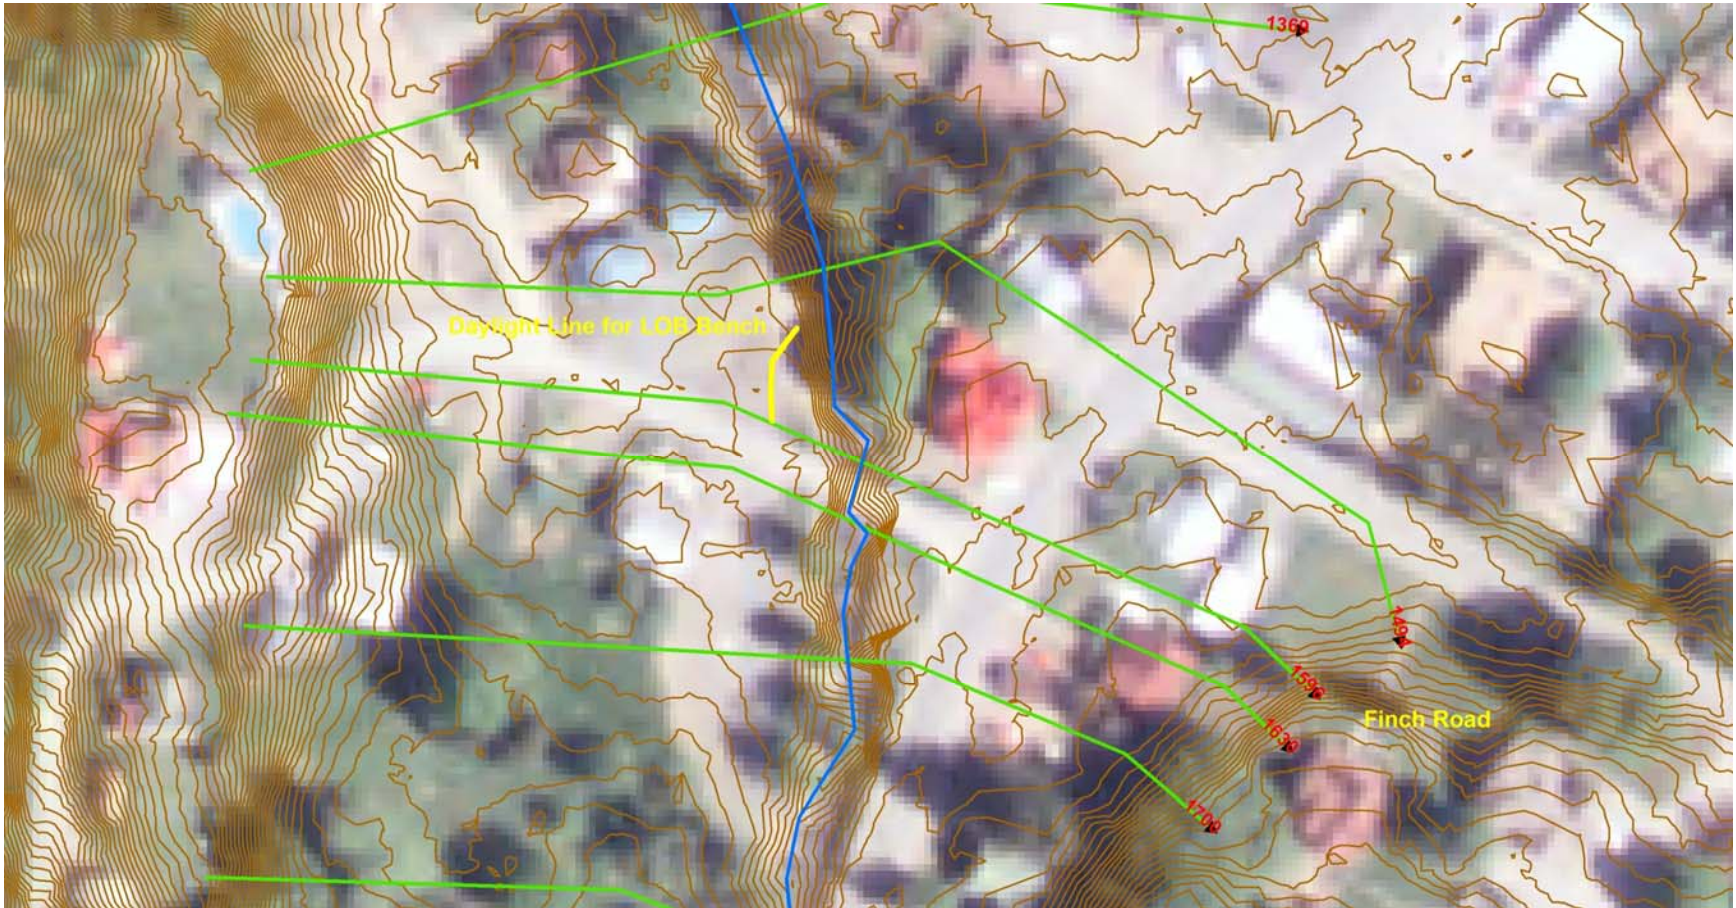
Conceptual Plan for Left Bench Downstream of Finch Bridge
